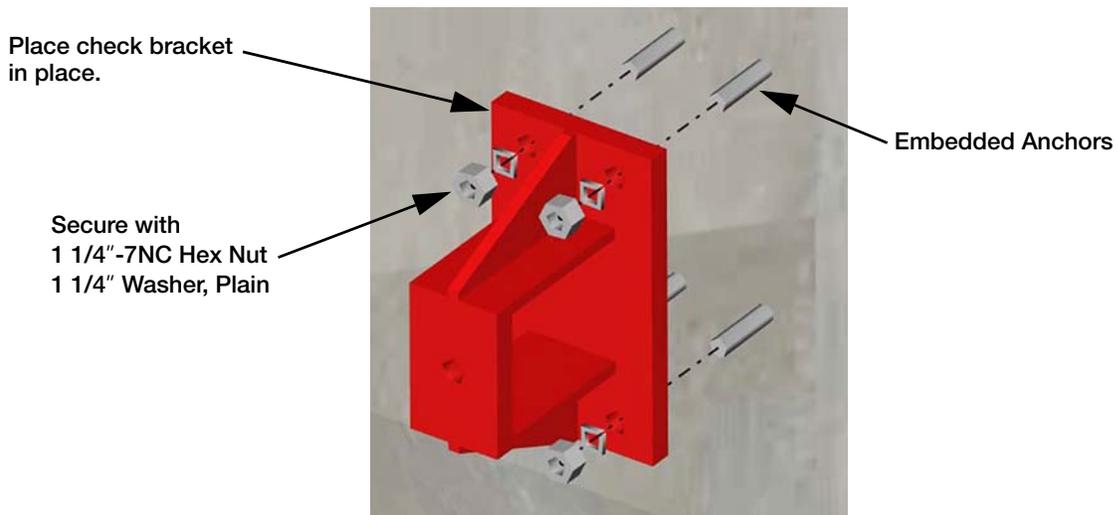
Check Rod Bracket on Foundation Side Wall
